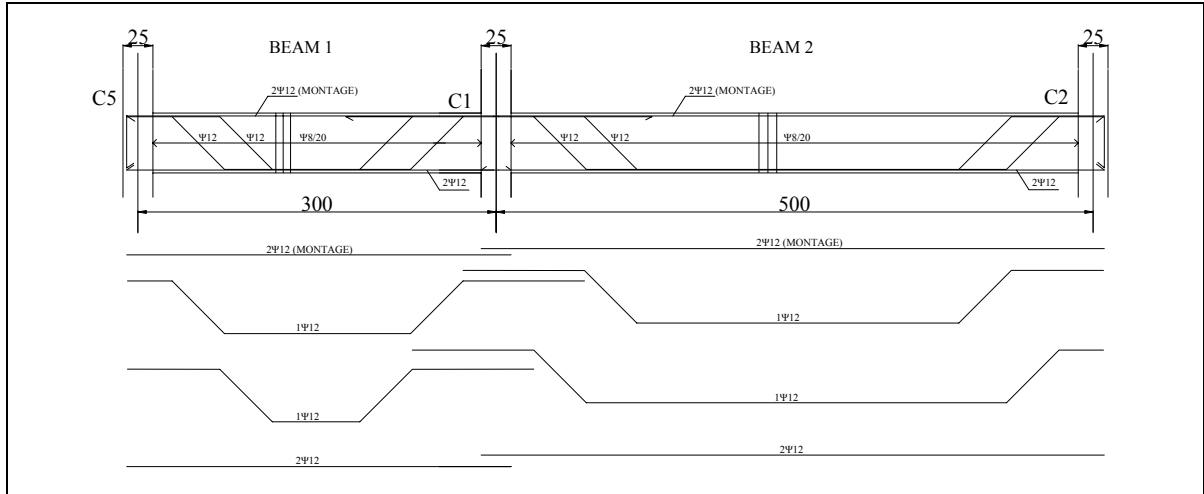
Beam 1 and beam 2 longitudinal reinforcement
